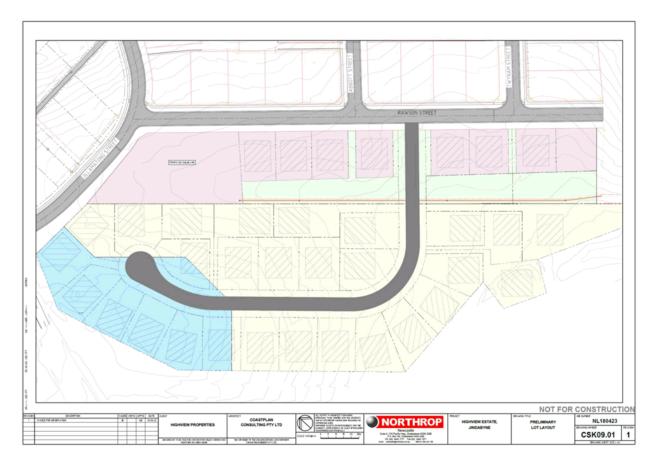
Potential Future Subdivision should the Planning Proposal be successful
